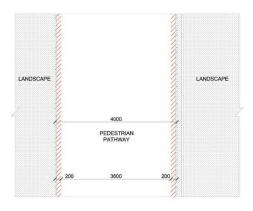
Street width and buffer spaces (in mm) for Gateway 1 in the area surrounding Darmstadt Hauptbahnhof
